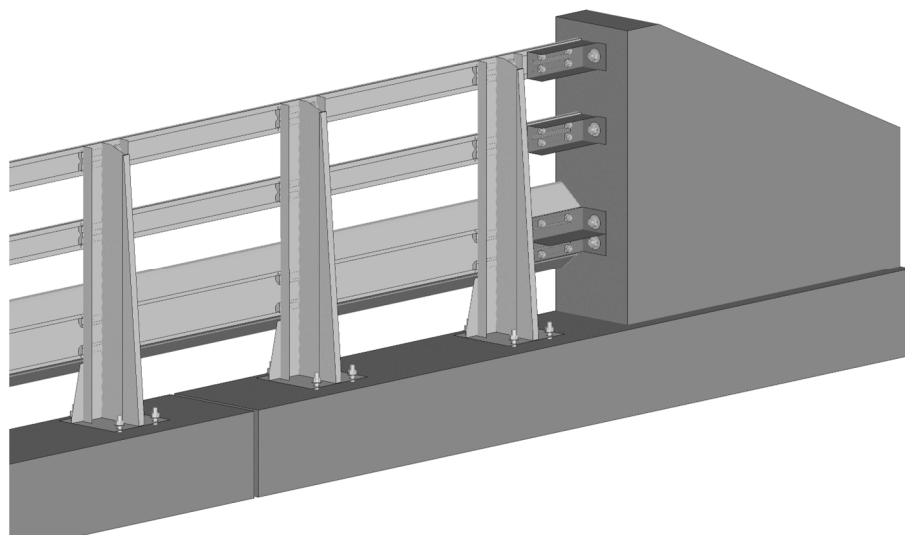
Rail connections to the concrete parapet and terminal of the TMBR.
